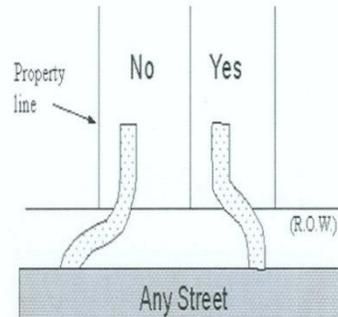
OTHER DRIVEWAY CONSTRUCTION STANDARDS
